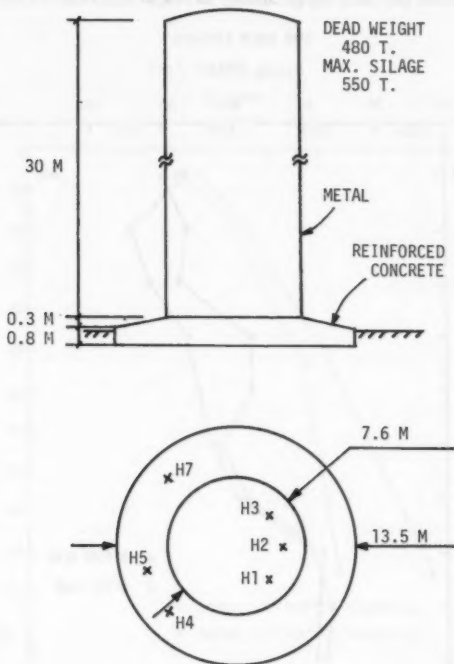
Clay Site: Silo and Slab Foundation (1 m = 3.281 ft)
